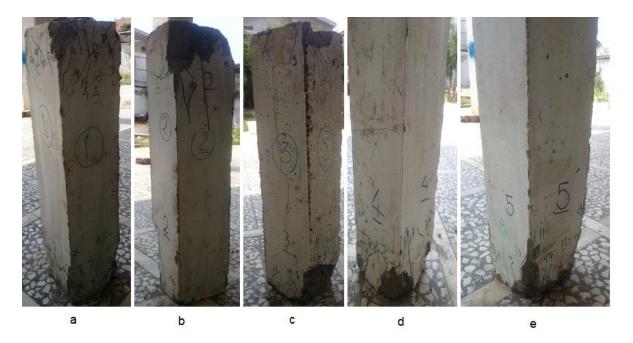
Showing the shape of the cracks after loading the right stones a) column 1 b) column 2 c) column 3 d) column 4 e) column 5
